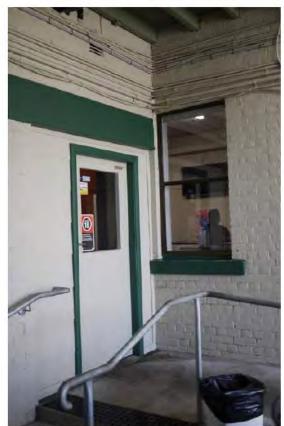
| Rear courtyard. Door to Inglis Street entrance hallway at left. Aluminium window frame to be replaced with timber-framed double-hung sash.
